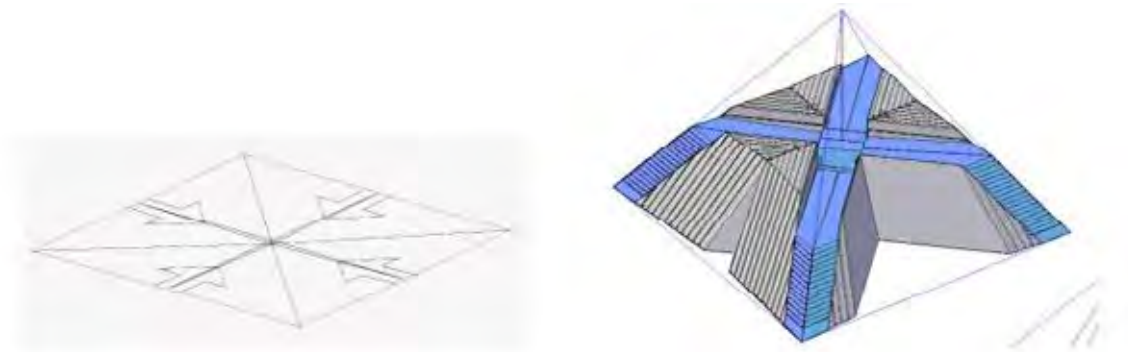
Khufu pyramid structure composed of two crossing diagonal walls encountering eight leaning to them walls; its base was divided into four inclined planes.
